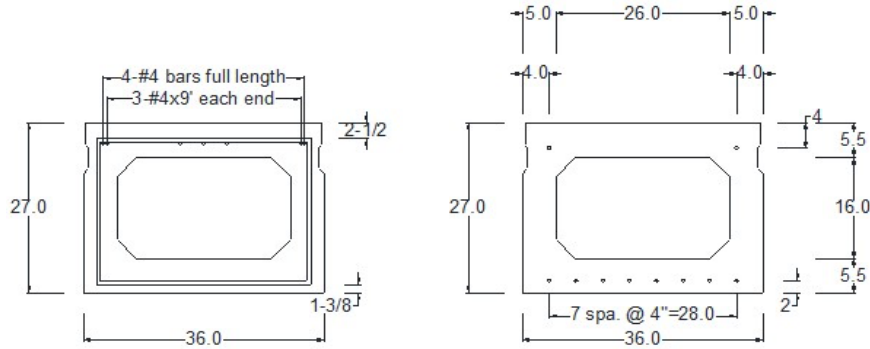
Cross-section of the in-service bridge's prestressed concrete beam.
